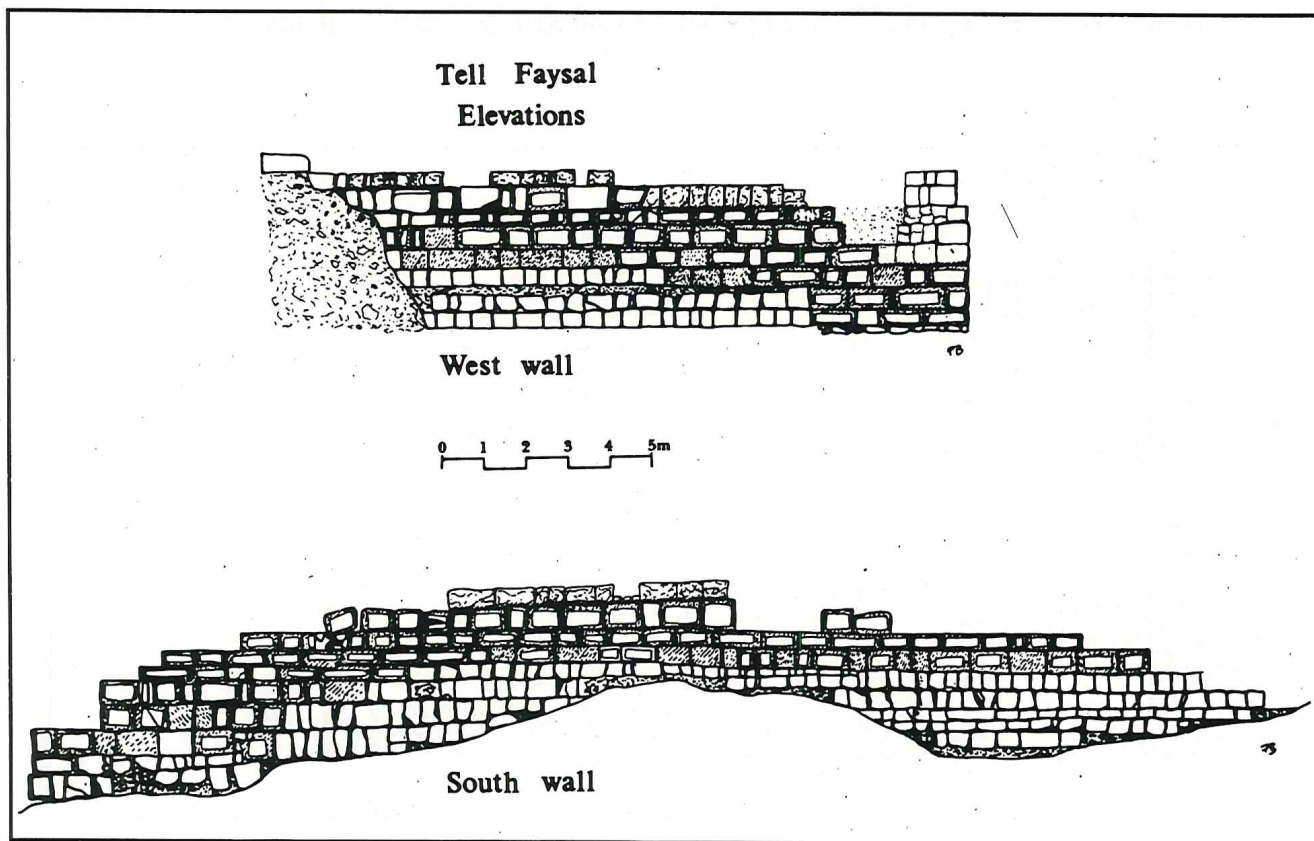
Elevations of west and south walls. Drawing by Pierre Bikai.
